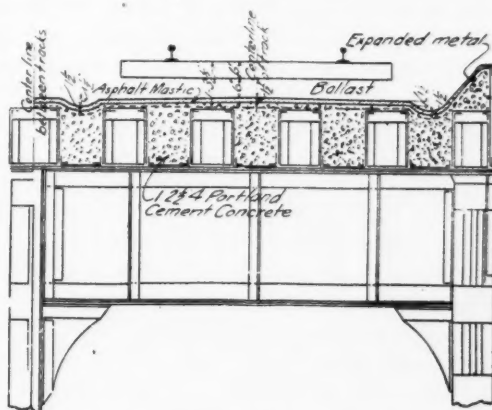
TYPICAL CROSS-SECTION OVER ROADWAY ON THE C. & N. W. RY.
